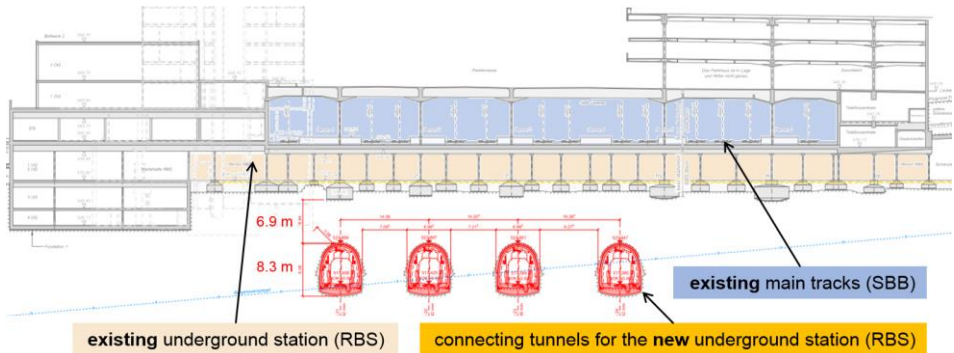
Cross-section of the four connecting tunnels for the new underground station. The existing underground station is located above these tunnels and directly covered by the tracks and platforms of the main station.
